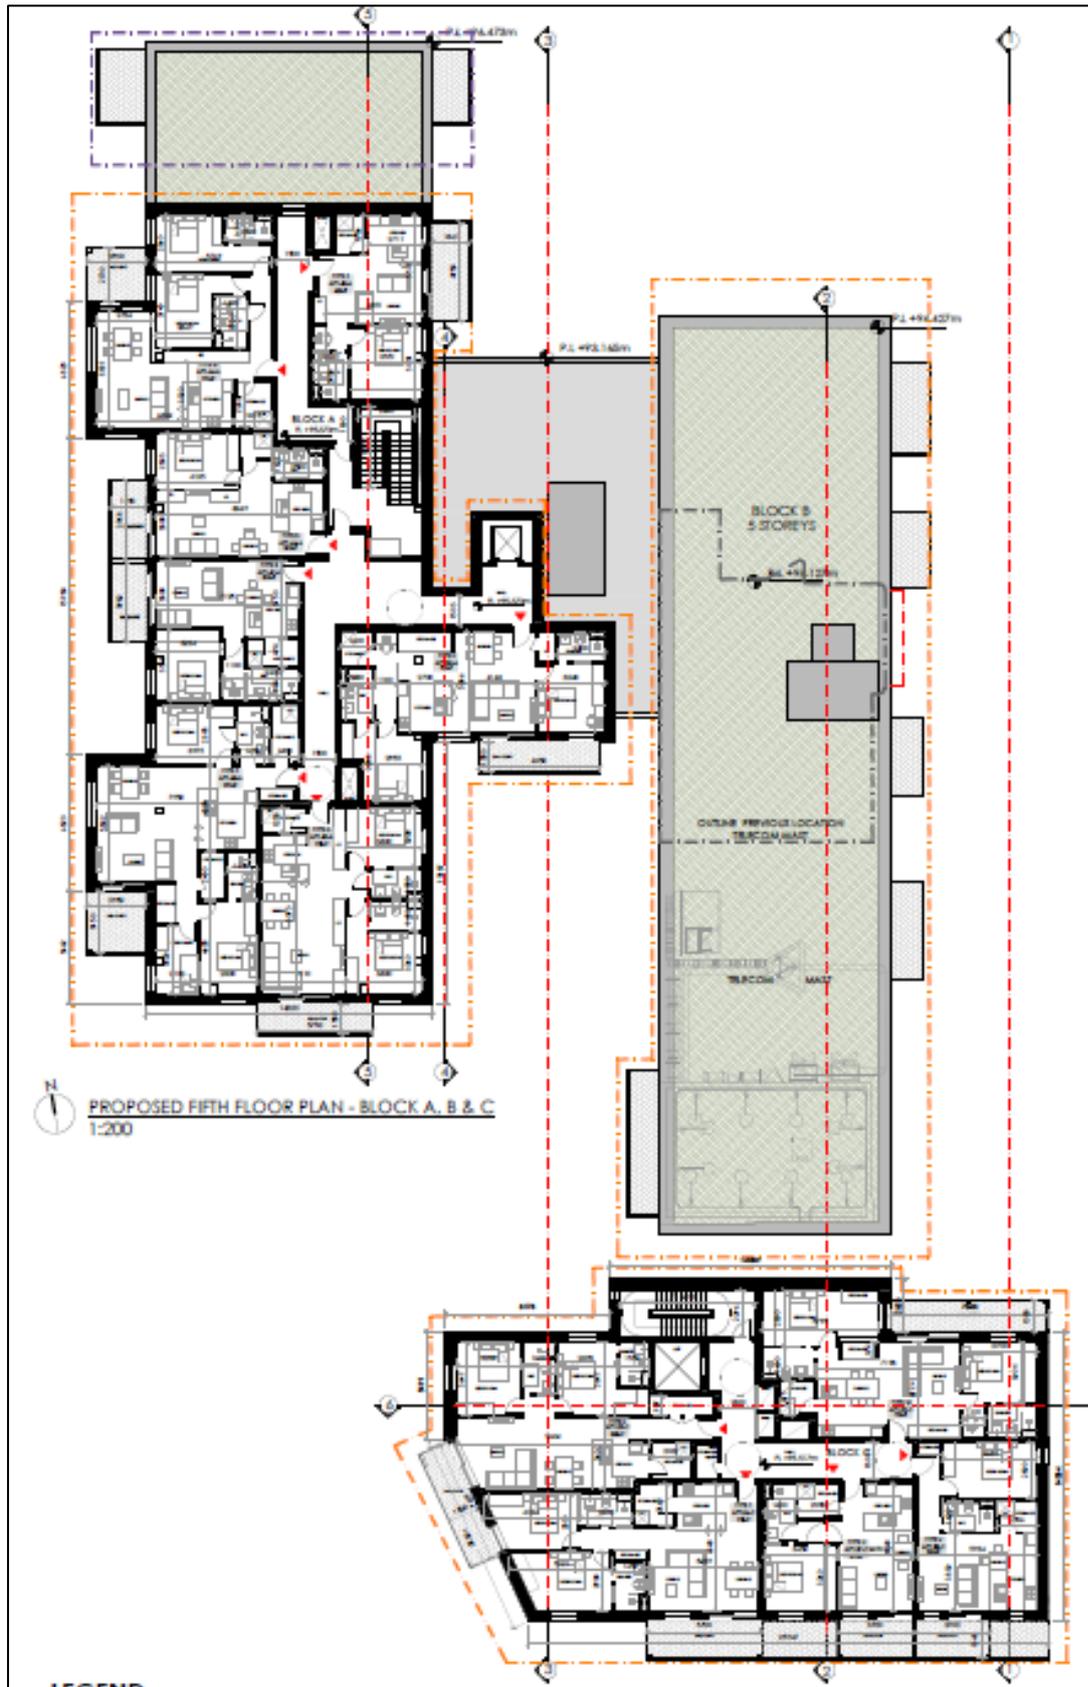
Fifth floor plan of the proposed Blocks A, B and C, as indicated the fifth floor level of Block A will be appropriately recessed from the Monastery Road frontage.
